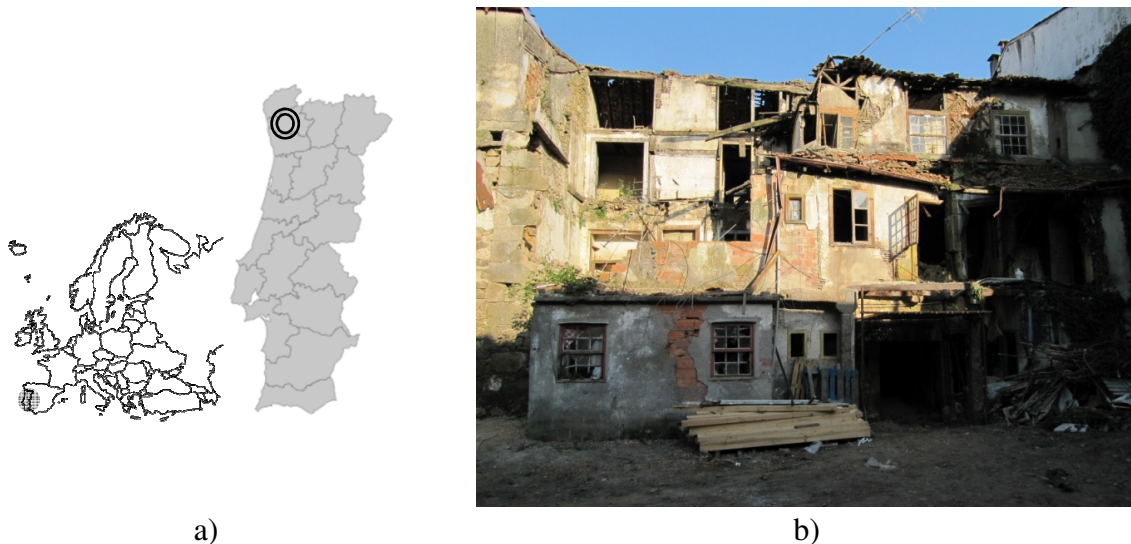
Original location of the timber beams: a) geographic location in Europe and Portugal; b) construction site.
